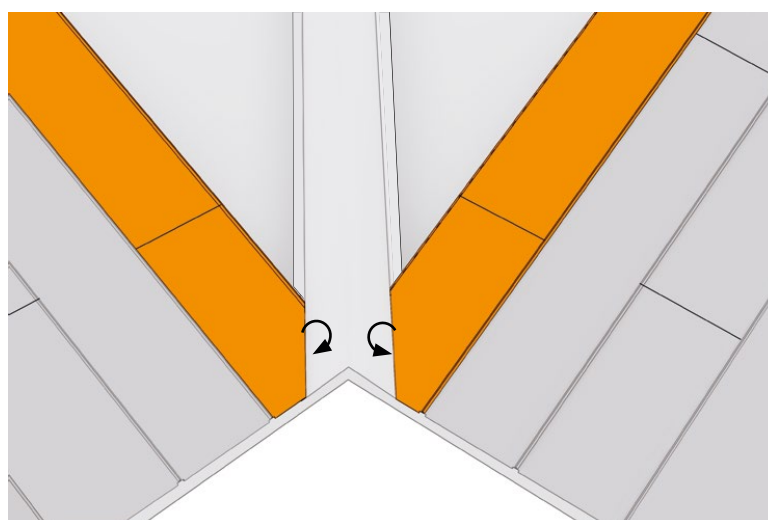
ASSEMBLY OF THE PANELS TO THE VALLEY GUTTER
